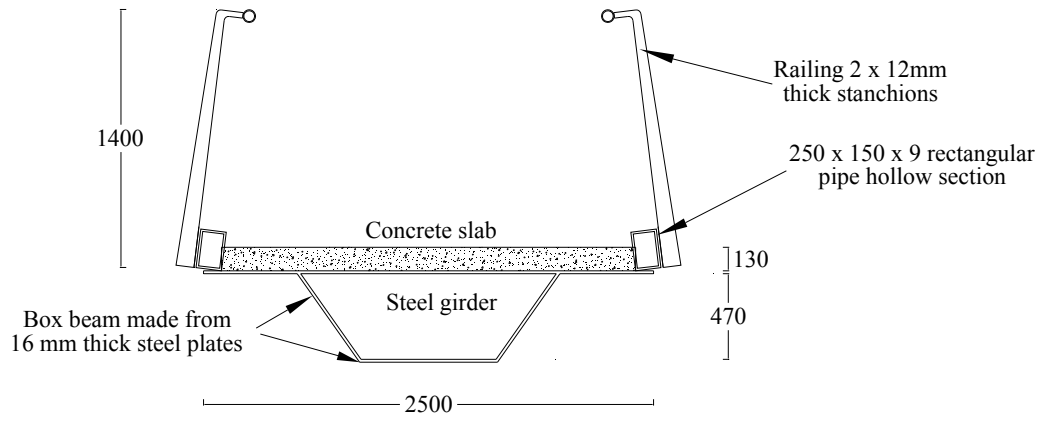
Cross-section of bridge deck (all dimensions in mm).
